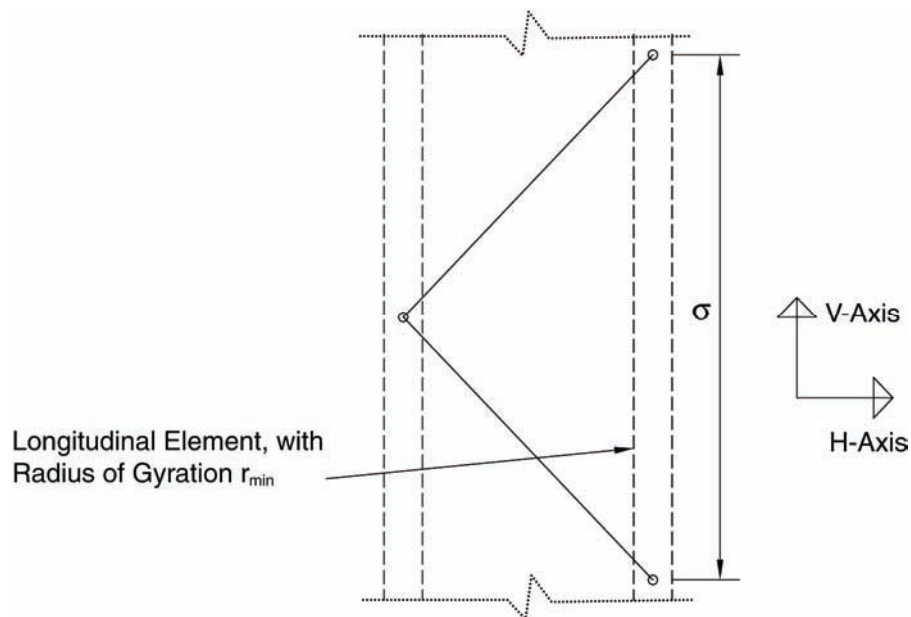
Slenderness of Longitudinal Elements of a Laced Member
